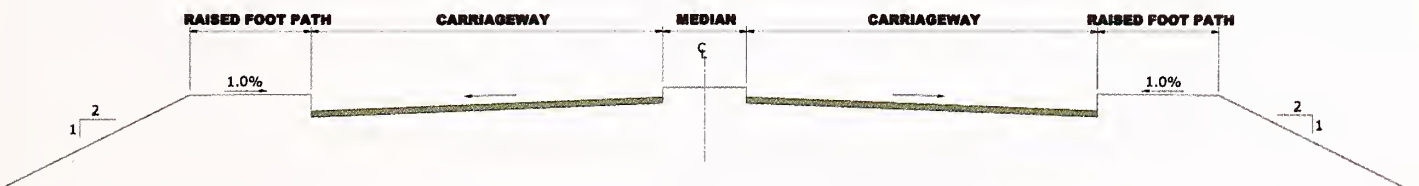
A Typical Cross-Section of Divided Carriageway with Kerbs (Urban Situation)
